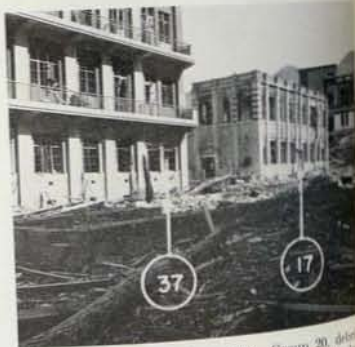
1,800 feet from GZ. Group 20, debris of buildings 35 and 36; Buildings 37 and 17 at left.
